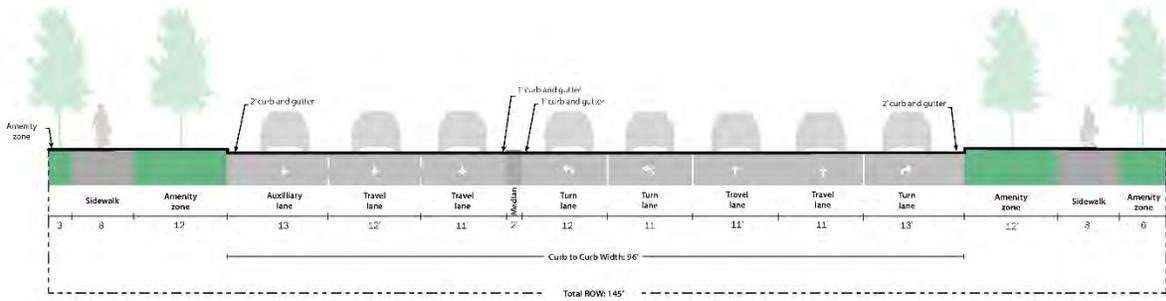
Section E (72nd Avenue West of Vrain Street – Looking East)
